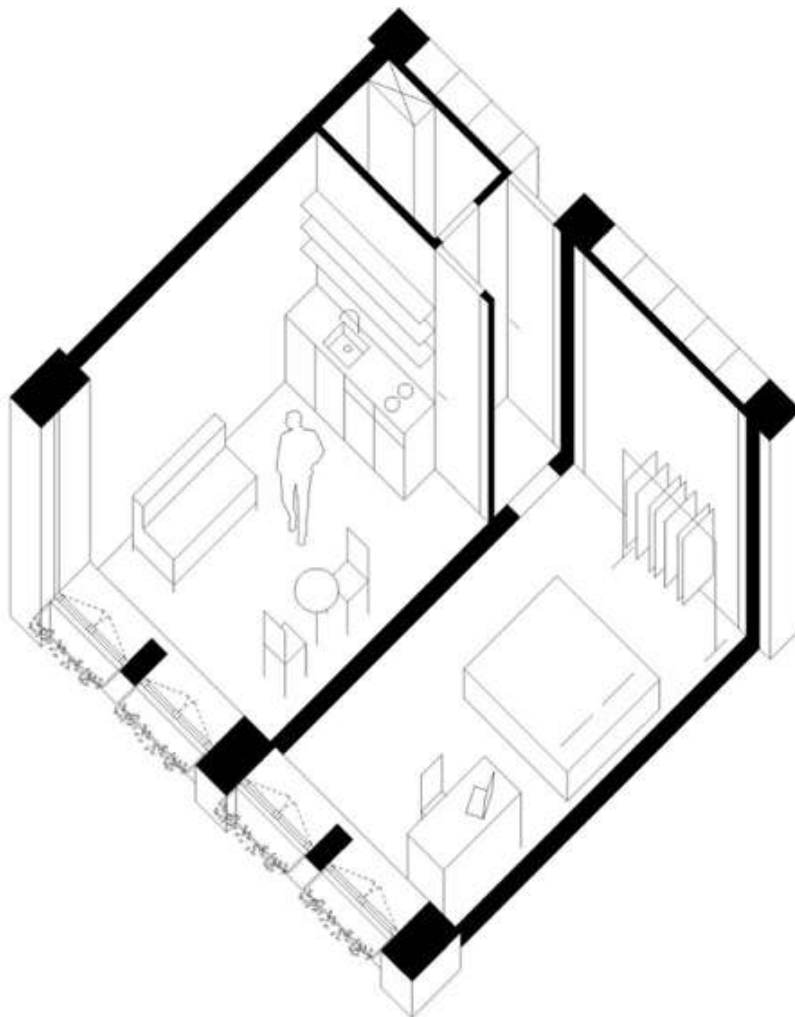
Housing, view / section of a basic unit. Authors: PLURALFig. 16: Living with two rooms, floor plan. Authors: PLURAL
